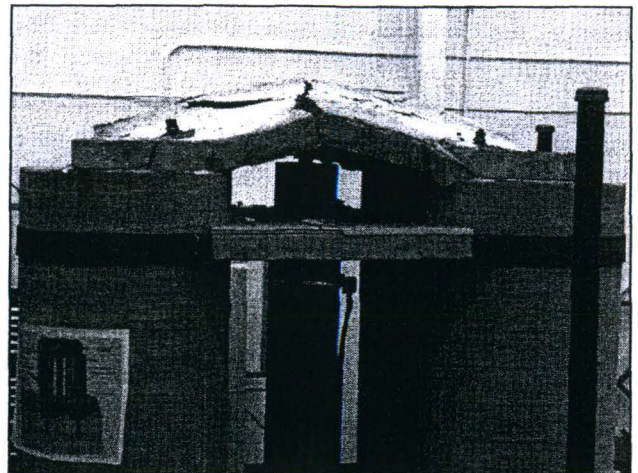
HEHD panel test sample loaded to 10-in displacement (side view).
